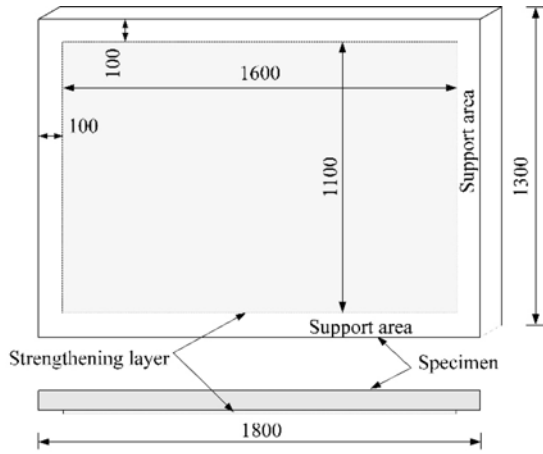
Schematic Diagram of Strengthening Layer (unit: mm)
